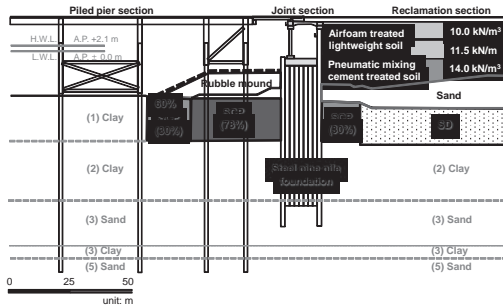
Cross-section of the joint structure between the reclamation and piled pier sections.
